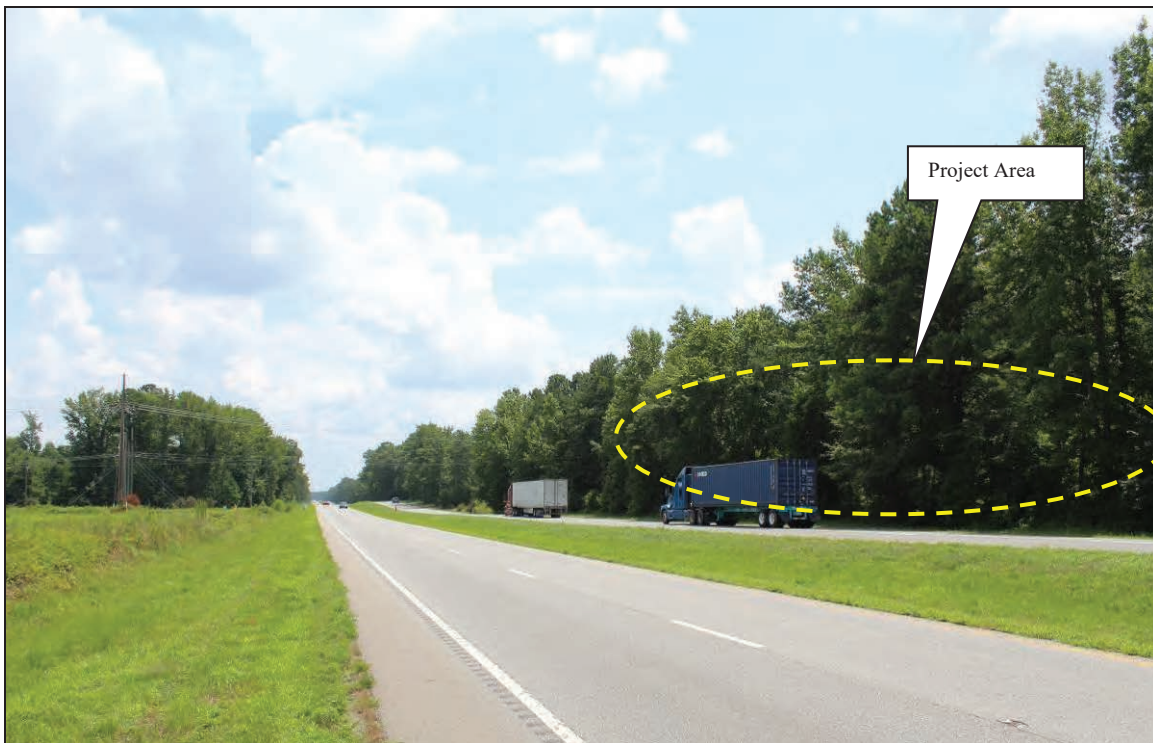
Photo location 8- View from US-58 bordering Chambliss House property towards project area (not visible) showing existing transmission line (not included in this rebuild project), facing east.
